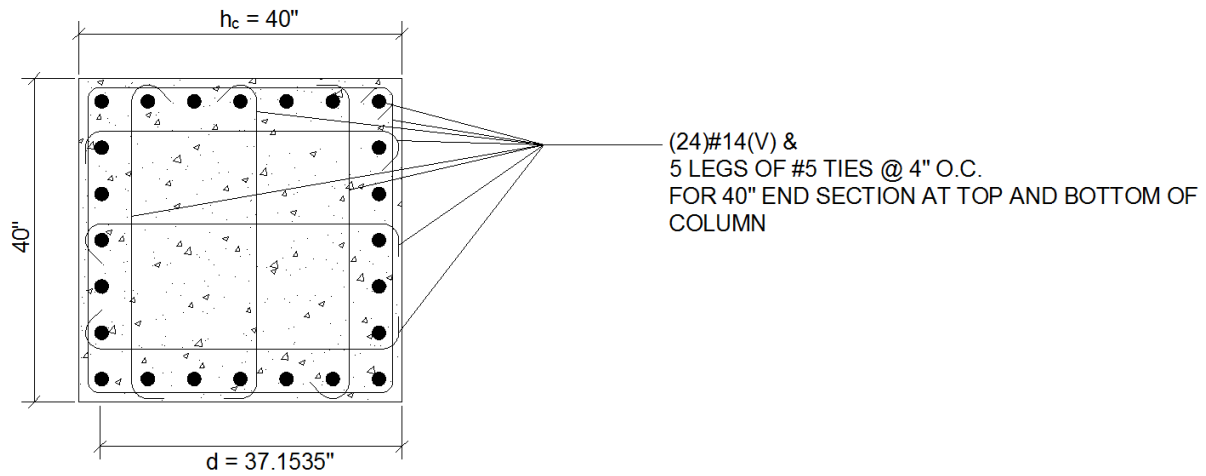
Exterior column, cross-section at end section of column at ground floor level based on tsunami design requirements.
